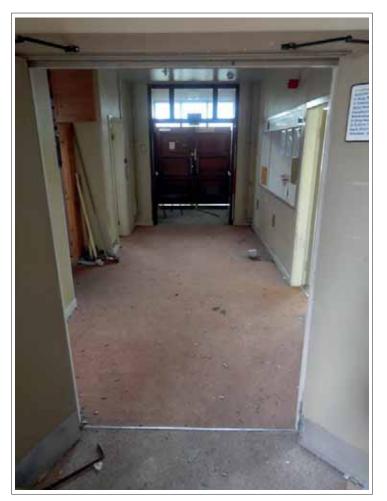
Front entrance hallway of the north annex, looking west. 2m scale.
